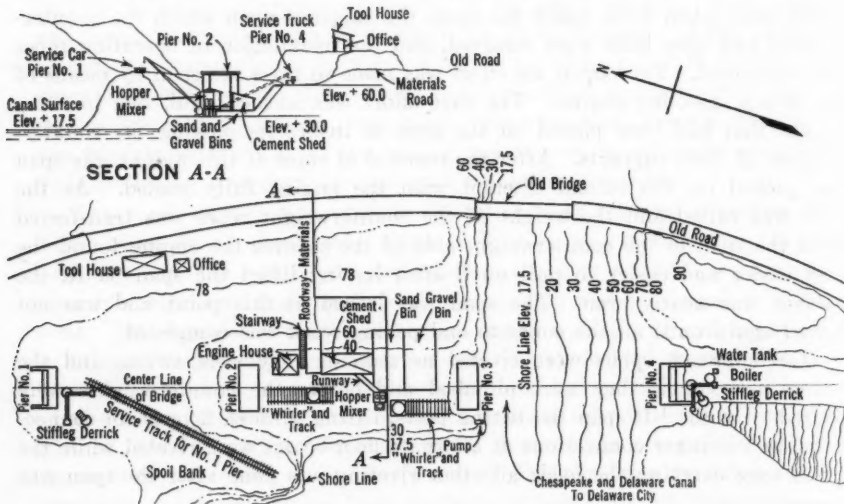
PLANT AND JOB LAYOUT, SUMMIT BRIDGE SUBSTRUCTURE.
